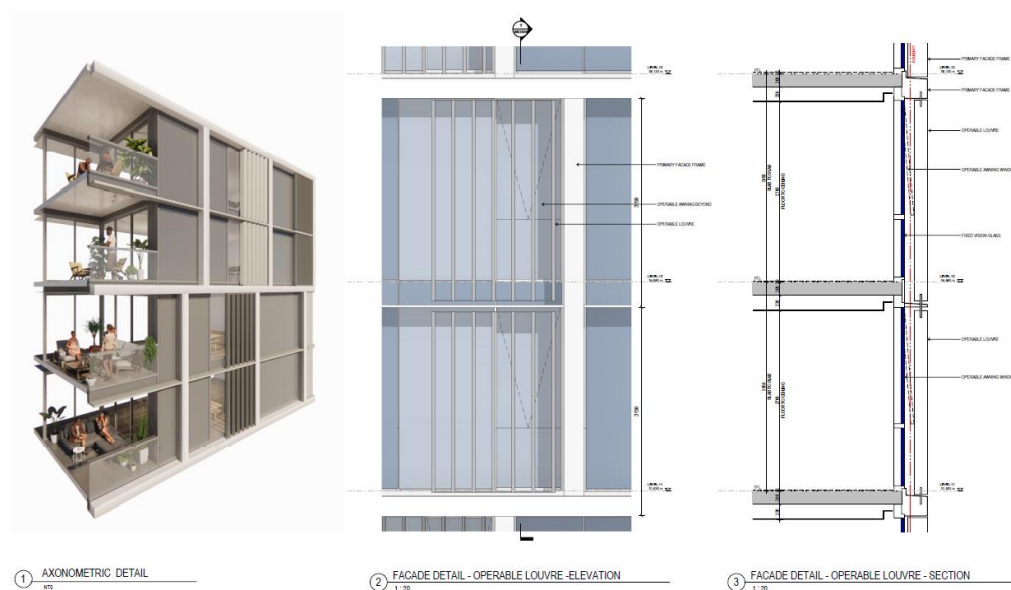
Details of proposed operable louvres submitted under D/2017/503/A
